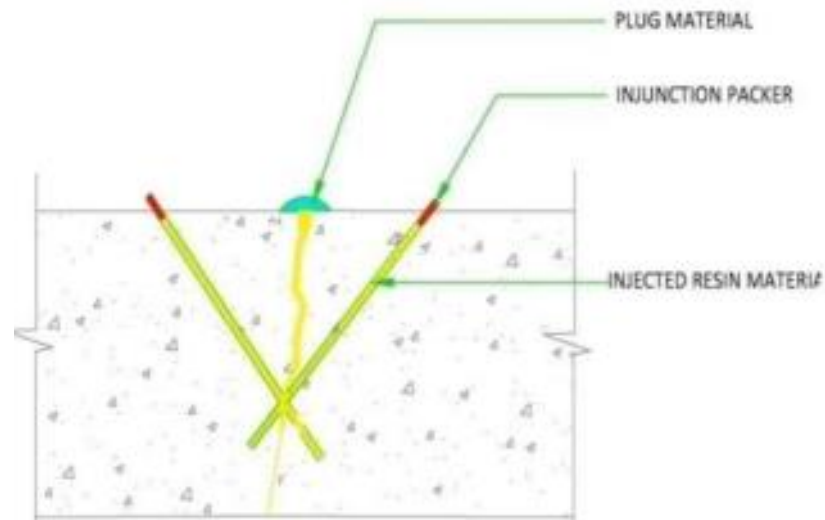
Injection of Epoxy: Section Showing Drilled Holes and a Crack Filled with Repair Material (6). Reprinted from “Concrete Repairing by Epoxy Injection”, Design Consulting Services.
